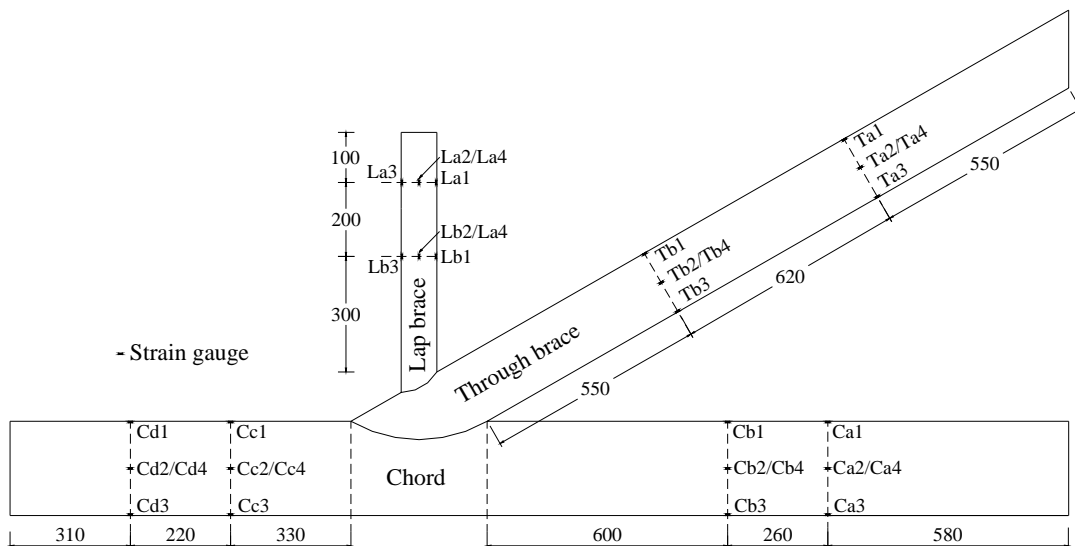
Locations of single element strain gauges (FLA-5-11-5L) on joint specimen tested under monotonic loading
